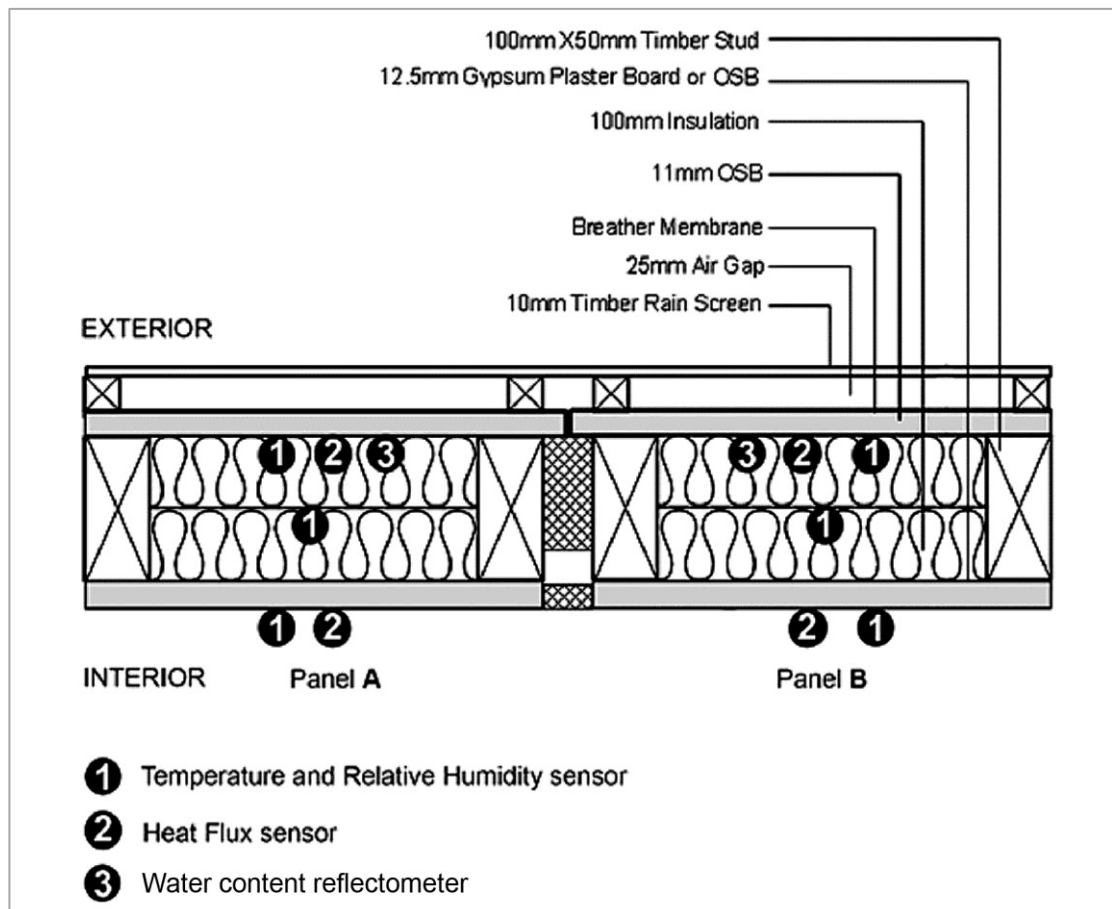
Horizontal cross section showing panel A and panel B and sensor locations in assembly-2.
